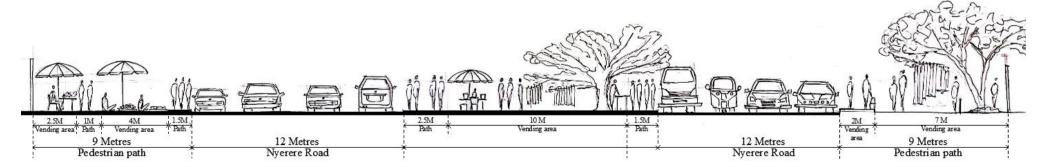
Section across Nyerere avenue, detail B. source: Author 2022
